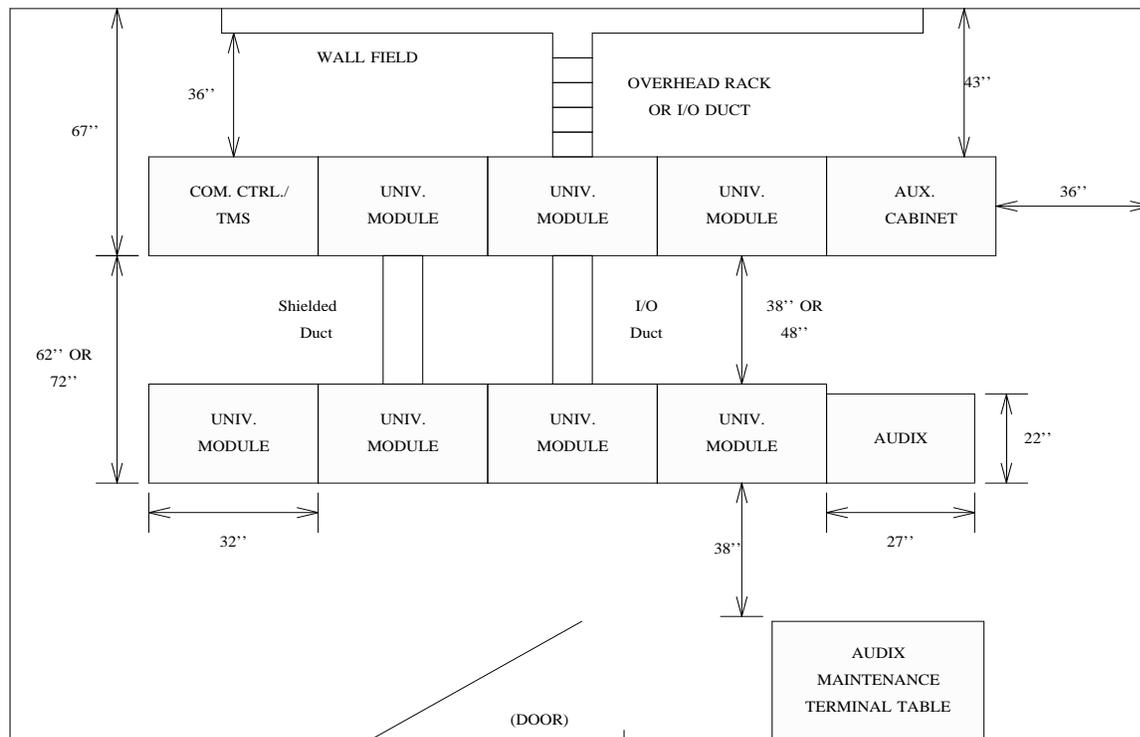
Floor Plan for Local AUDIX System, System 75, Generic 1, or Generic 3i/s
